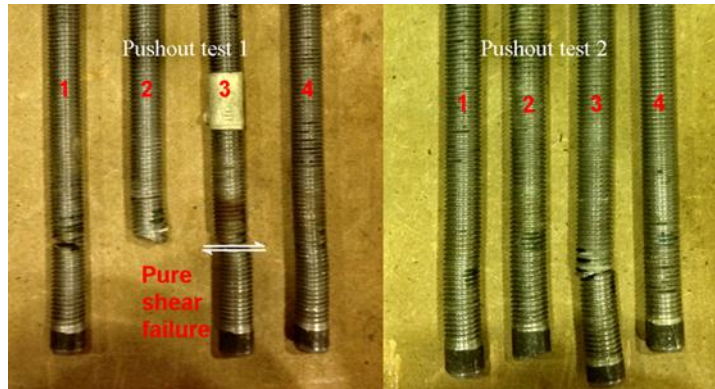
Bolts deflected shape of Tests 1 and 2
